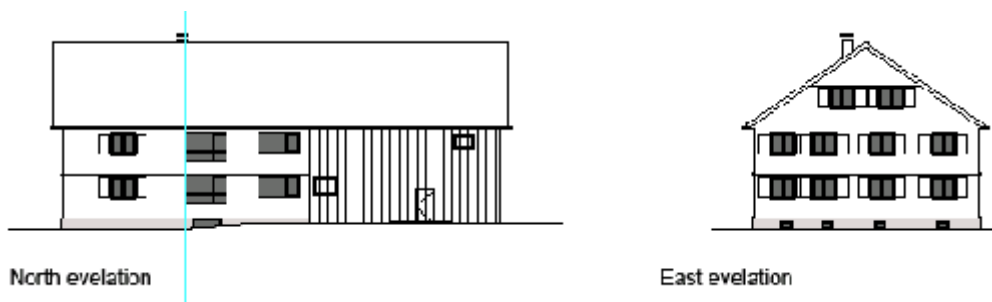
AlpHouse pilot-building R. in Andelsbuch, elevations Bregenzerwaldhaus from 1860s after renovation, by Arch. G, Gruber for EIV
